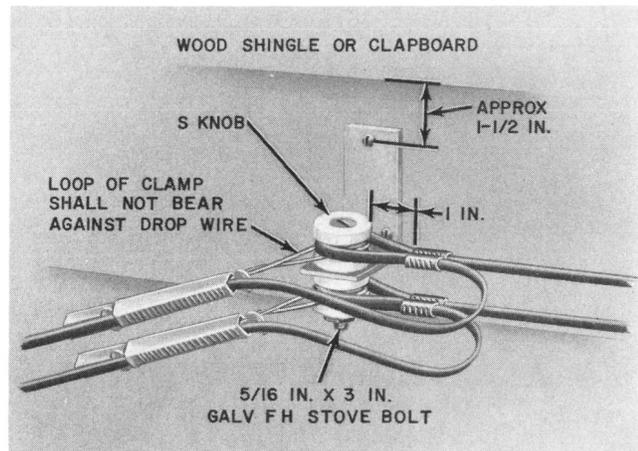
First Attachment—House Bracket (Horizontal Run, Double Wire) With S Knob
